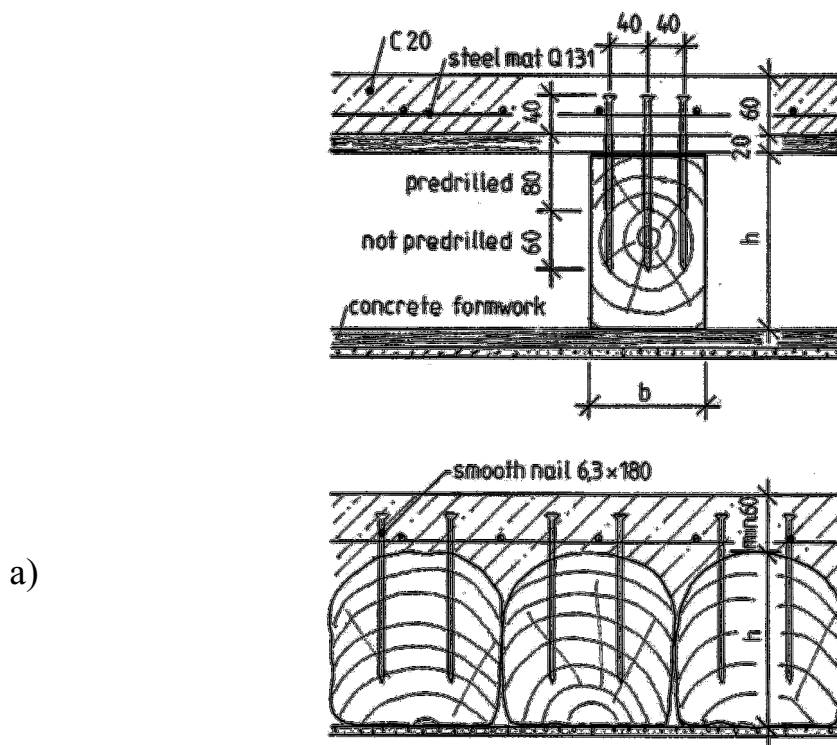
, b: Timber-concrete connection with medium sized smooth nails after [3]
